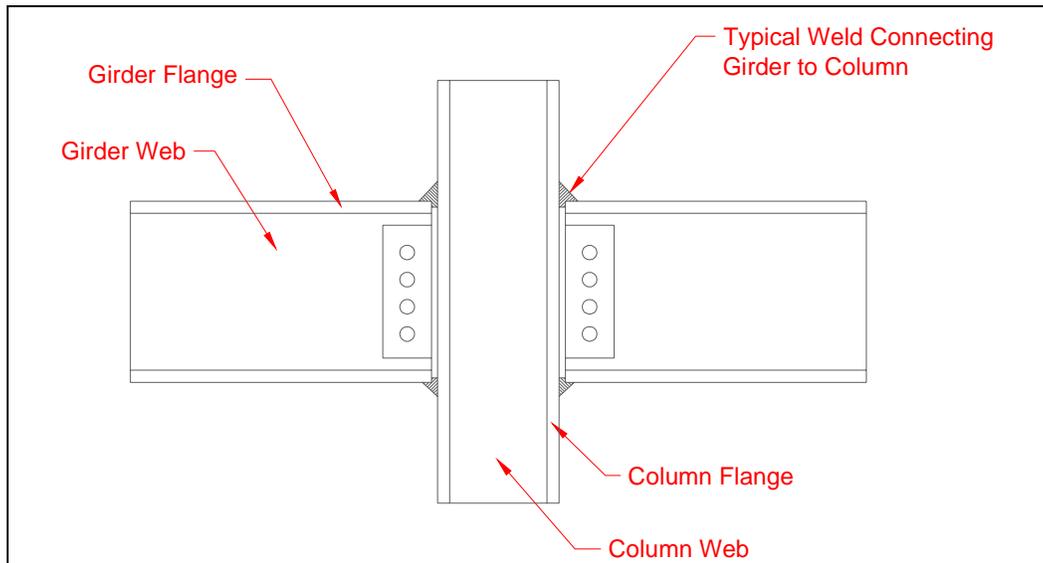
Conventional welded structural steel frame beam/column connection.
